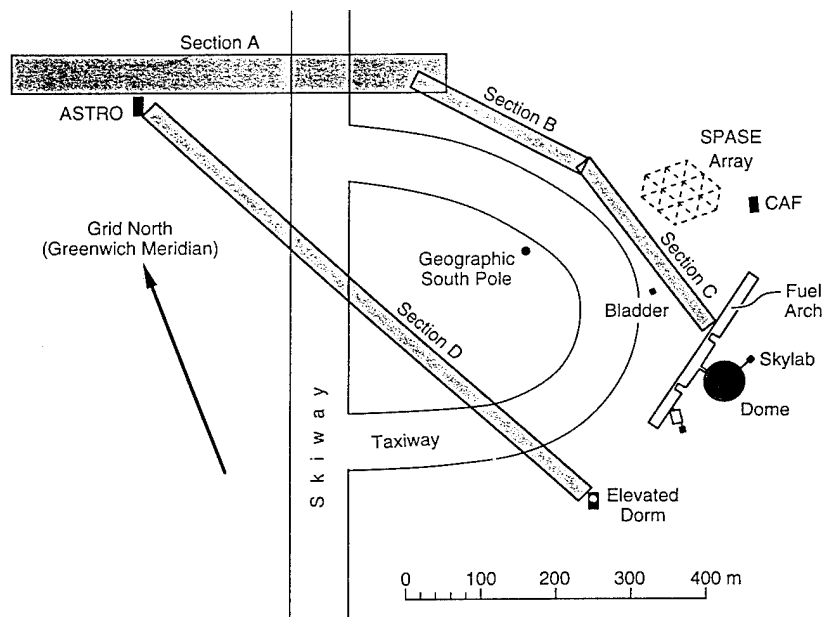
Proposed tunnel routes. Sections A, B and C run from the dome to the ASTRO and CARA (under construction) astronomical facilities. Section D is a 10-m wide section that extended 800 m from the ASTRO building to the elevated dormitory across the skiway.
